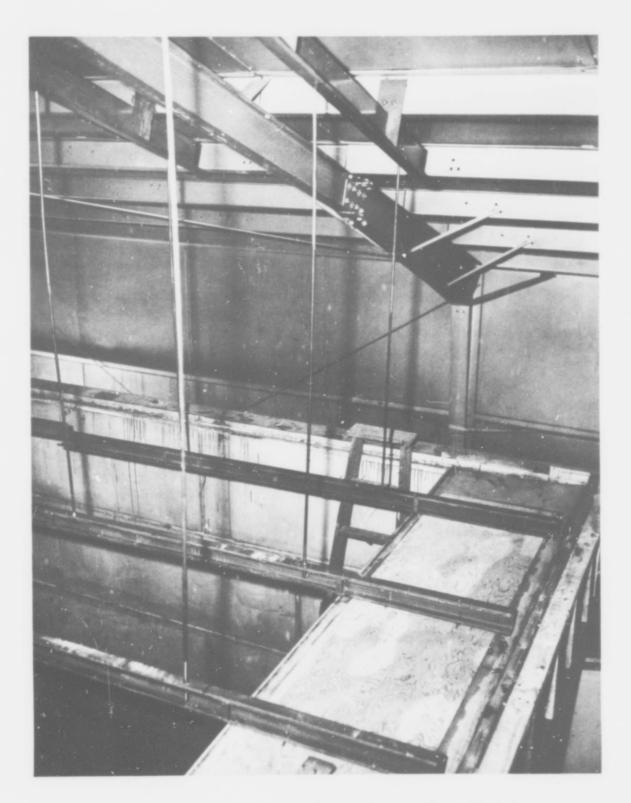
View looking down on partially completed ceiling. Wall shown is west wall.
